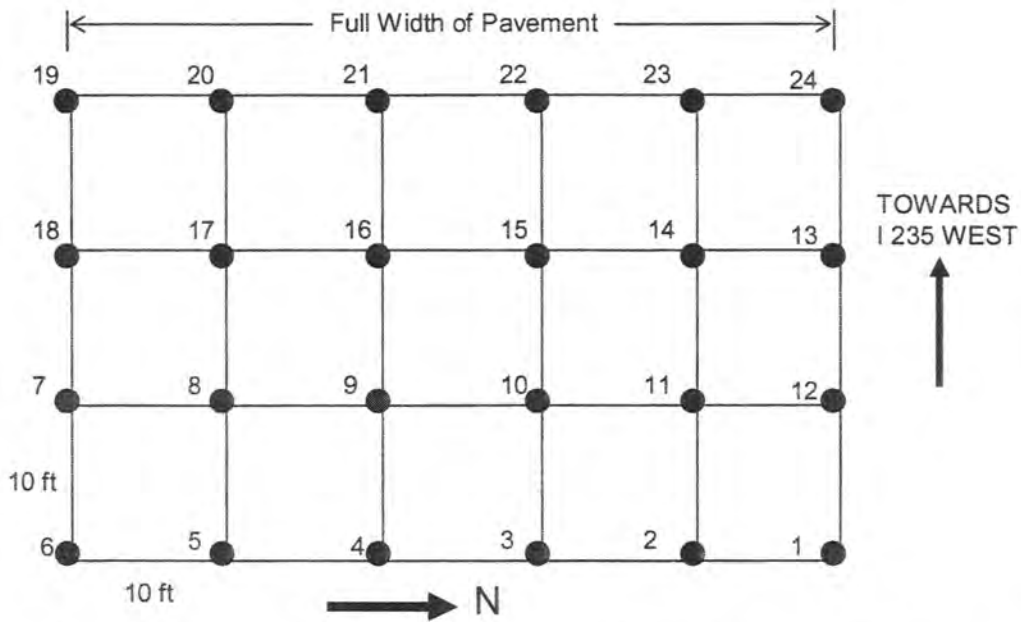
Grid Setup for Testing at 35<sup>th</sup> street Modified Subbase Construction Site
